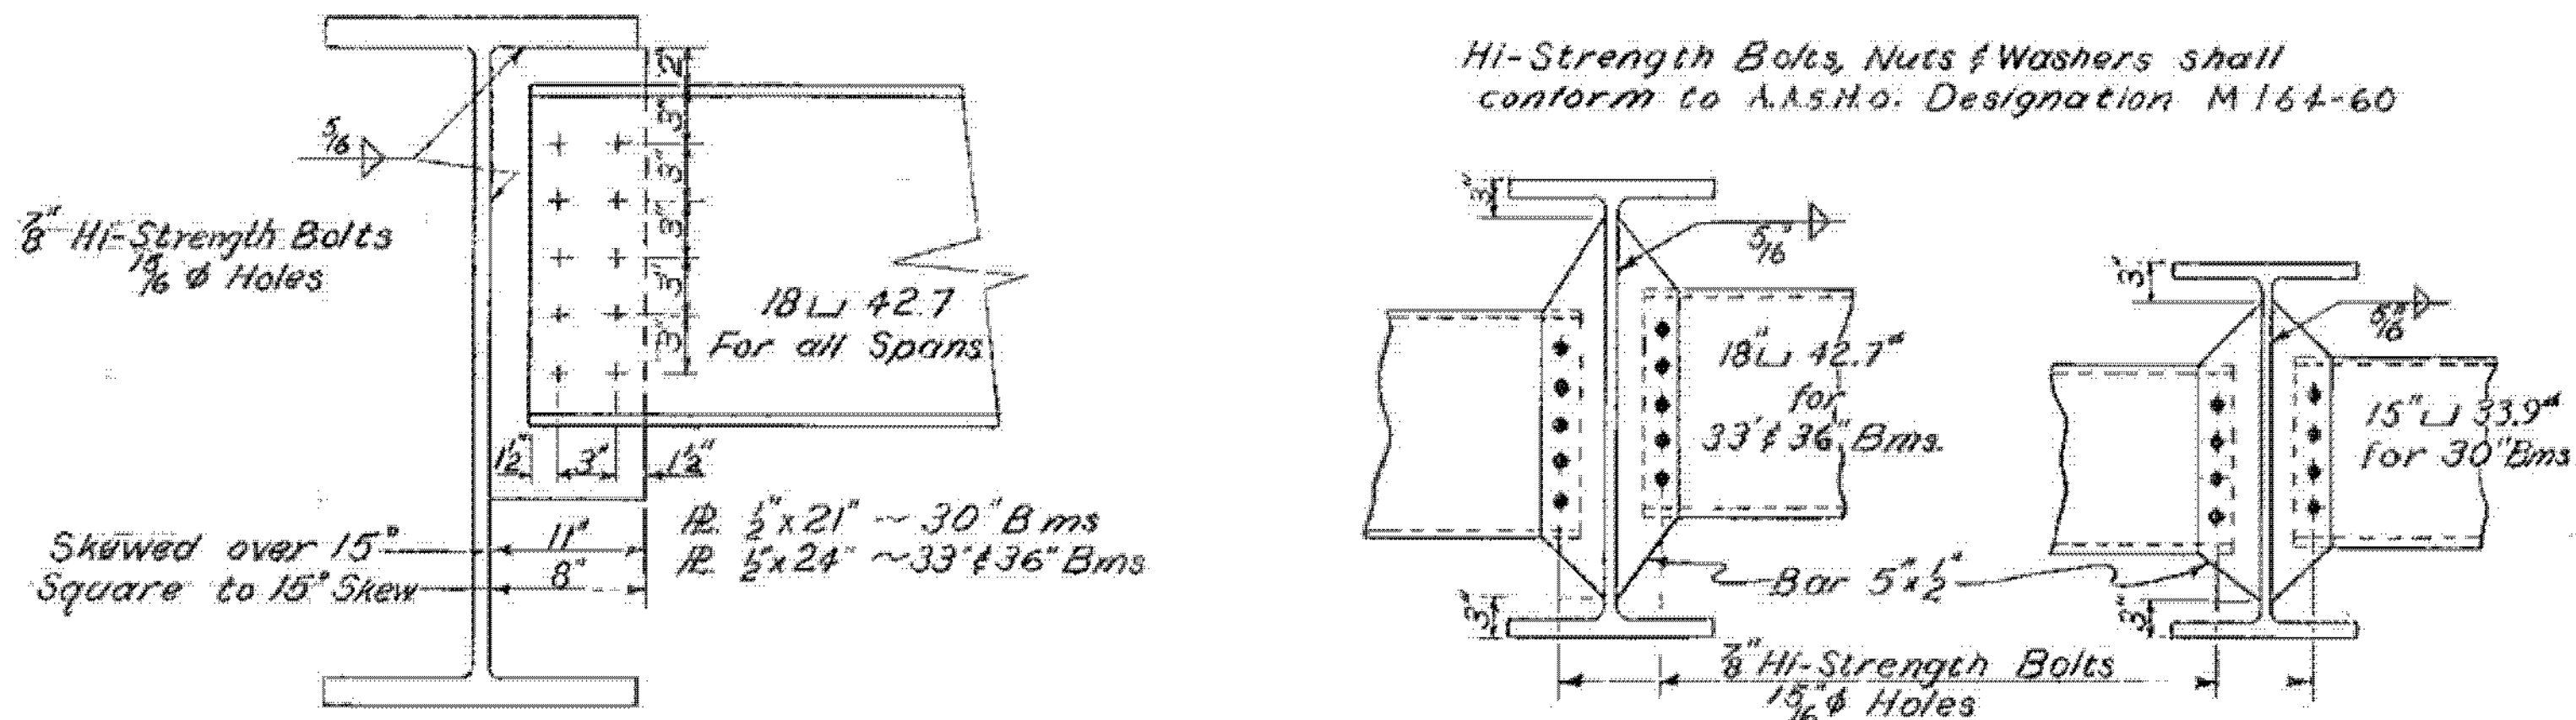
DETAILS OF PIER DIAPHRAGM CONNECTIONS
